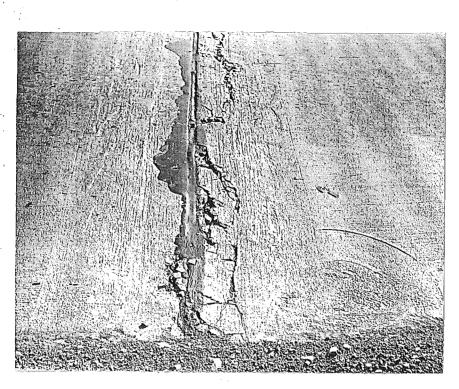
Typical Spalling of Concrete Due to Joint Condition.
